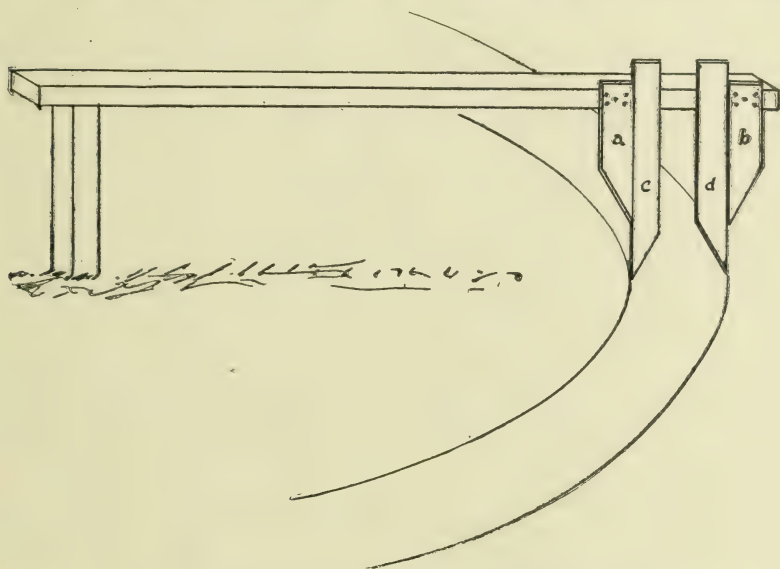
, METHOD OF LAYING OUT THE FOUNDATION
